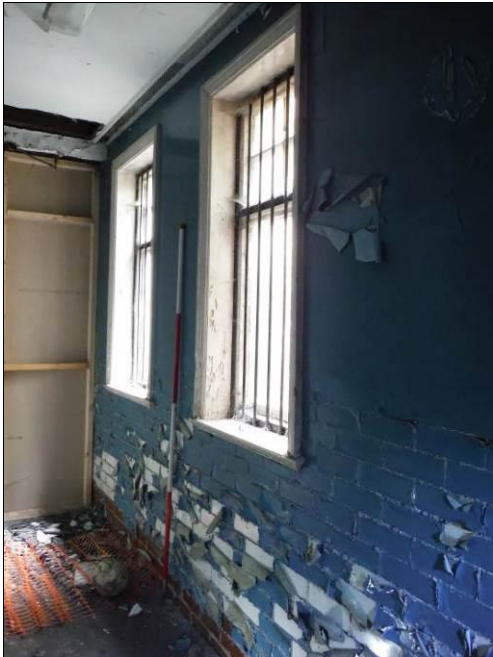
Detail of windows in north wall of Room G2, Building A (Scale= 2m).
